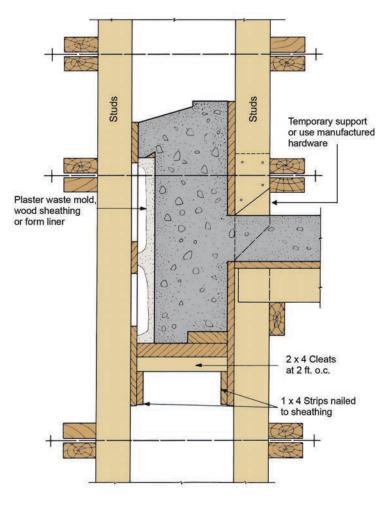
Spandrel form supported by studs extended past wall opening and sheathing also extended part way across opening (Image courtesy Portland Cement Association)
